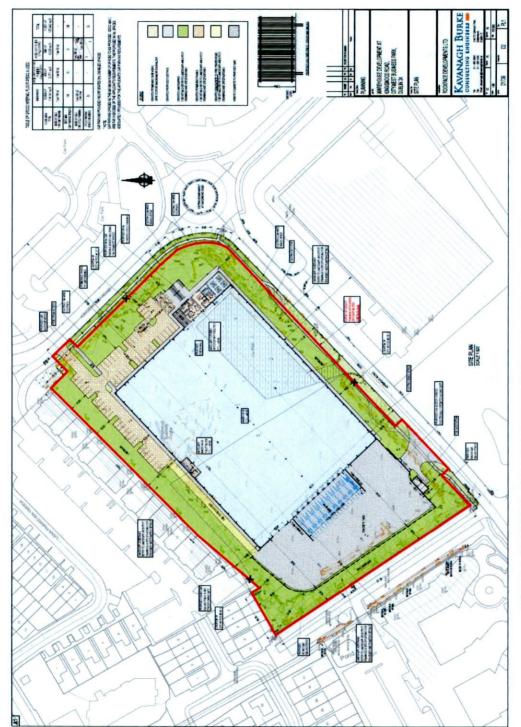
PROPOSED SITE LAYOUT (KAVANAGH BURKE CONSULTING ENGINEERS).
